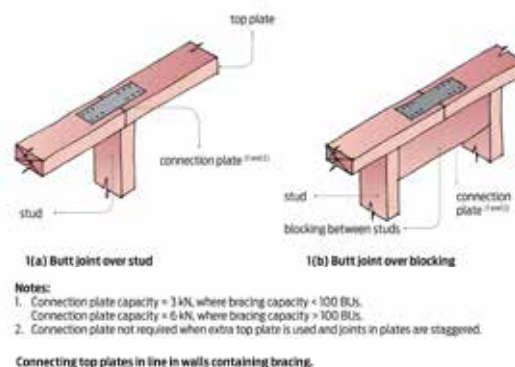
Connection top plates in line walls containing bracing. Image supplied by BRANZ/Build magazine.
